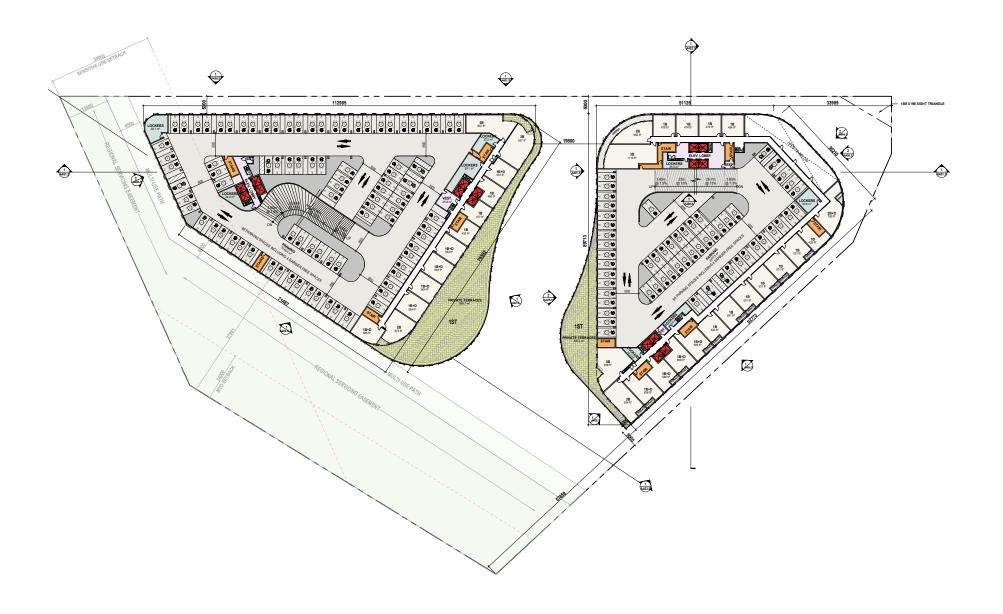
Level 2 Floor Plan (BDP. QUADRANGLE ARCHITECTS LTD.)
